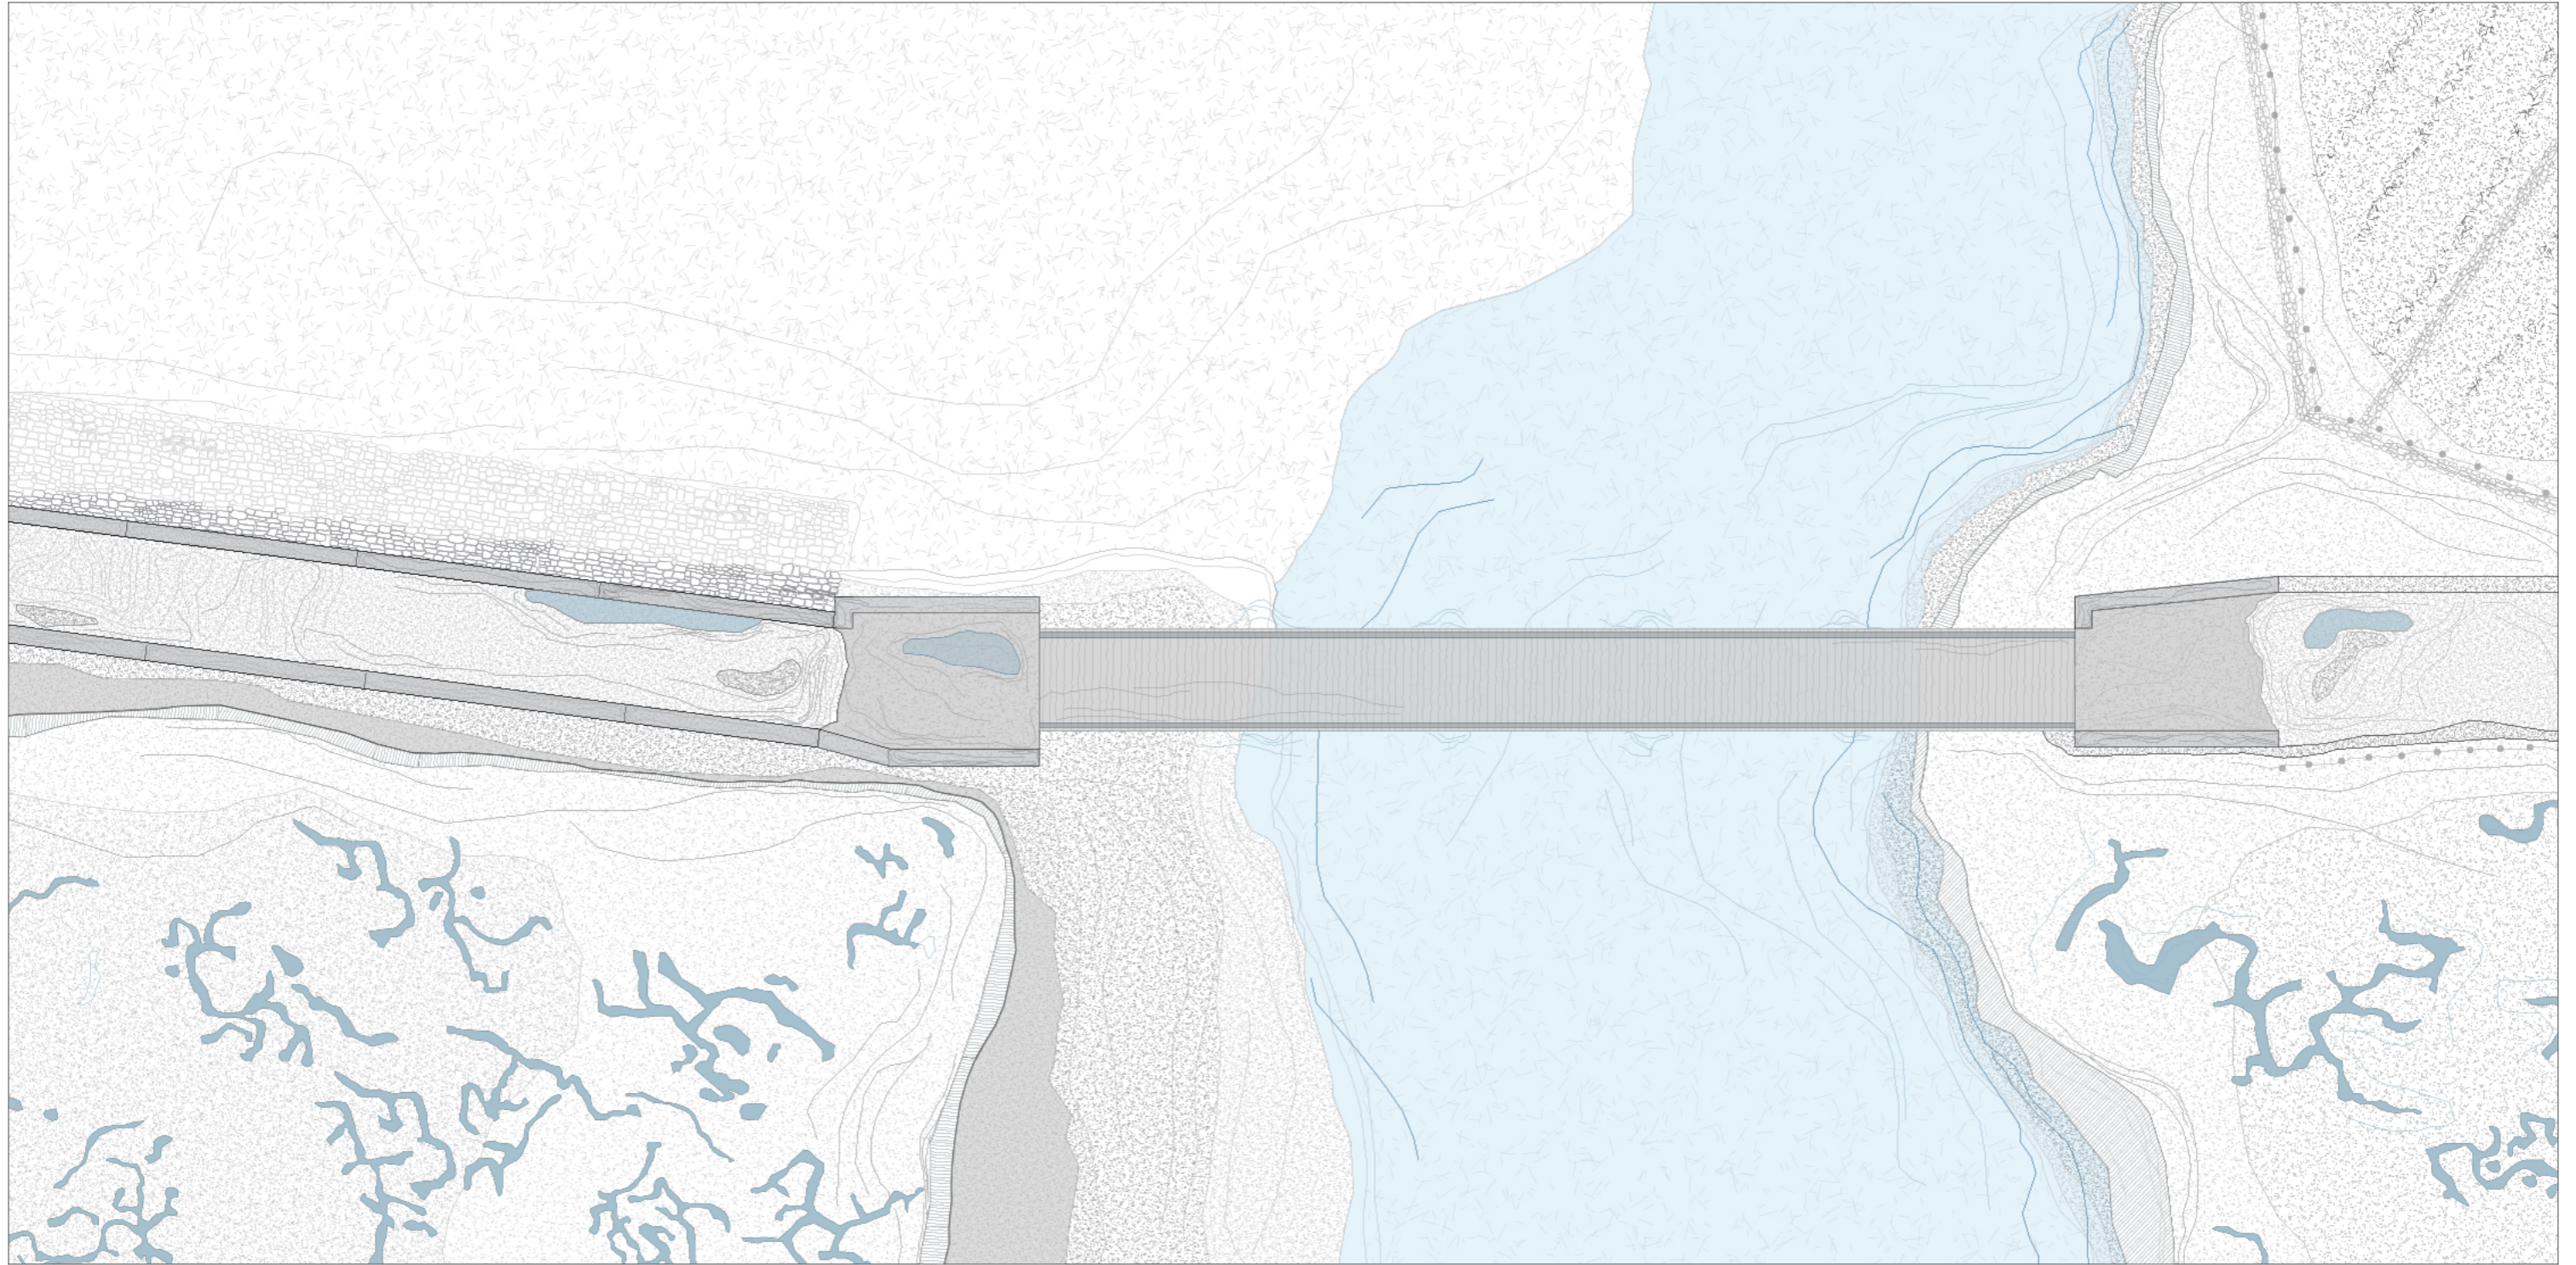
, Author, "Mulranny Causeway and Bridge Plan", Drawing, 2022
